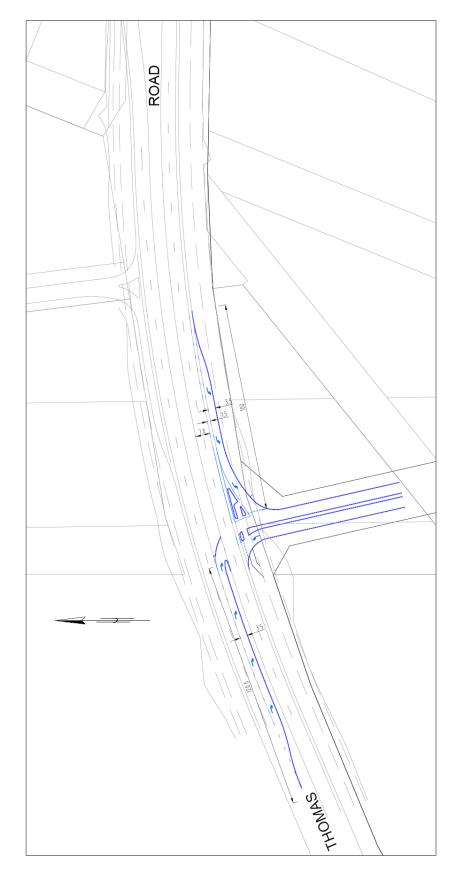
Proposed Concept Design for Thomas Road/ Road 1
